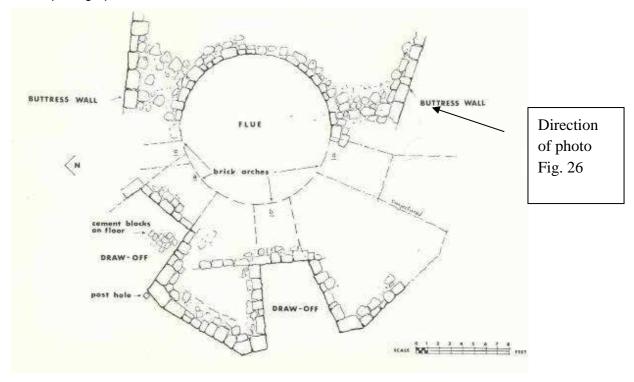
Plan of excavated Larger Kiln - Culican and Taylor Plate XVII p.49
